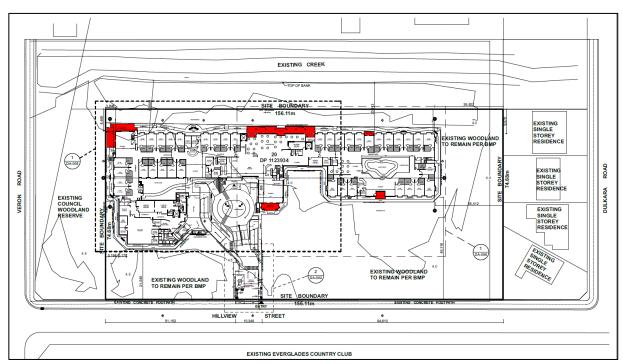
Architectural Site and Locality Plan showing proposed building footprint and relationship of adjoining residential dwellings
